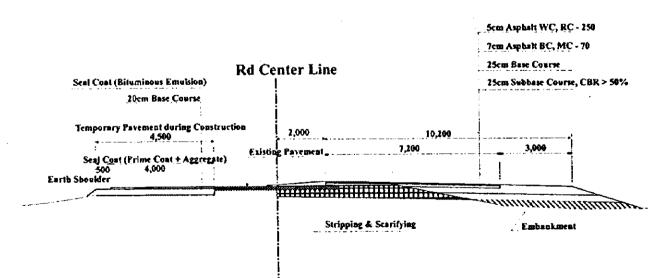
Relationship between Existing and New Pavement Structures
